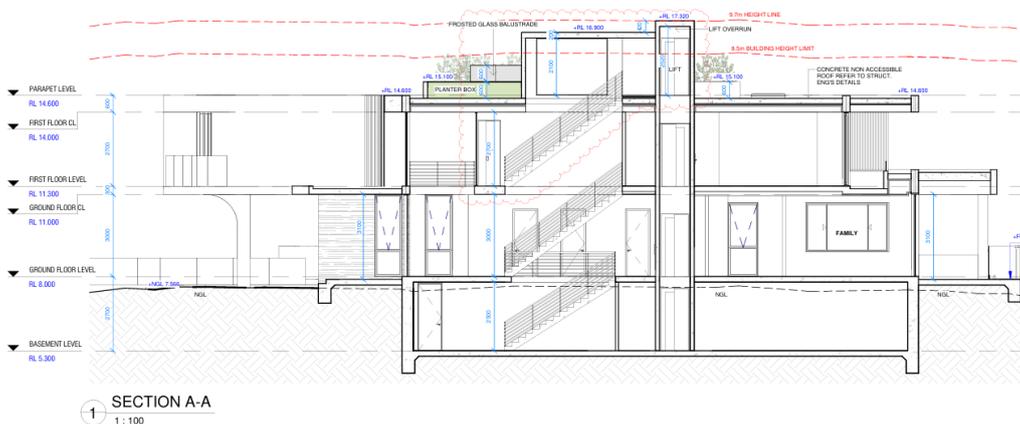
The staircase to the basement is excluded in FSR. The ground floor staircase to the first floor is included in FSR (Source: Resolut, 2024).
